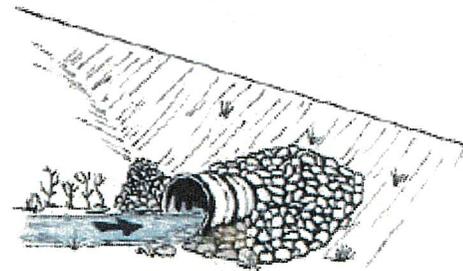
B. Riprap armor at culvert inlet (Keller and Sberar, 2003).
